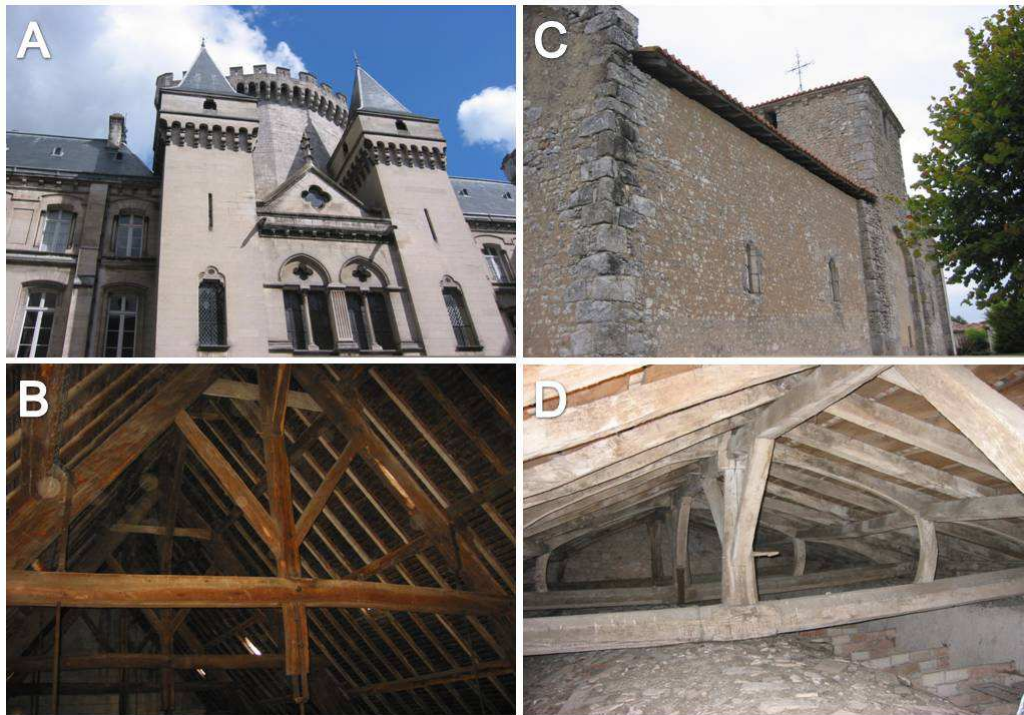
Examples of historic buildings and roof beams where wood samples were taken: La Rochefoucauld Castle (A, B) and the church of Poullignac (C, D). Photographs M. Stievenard.
